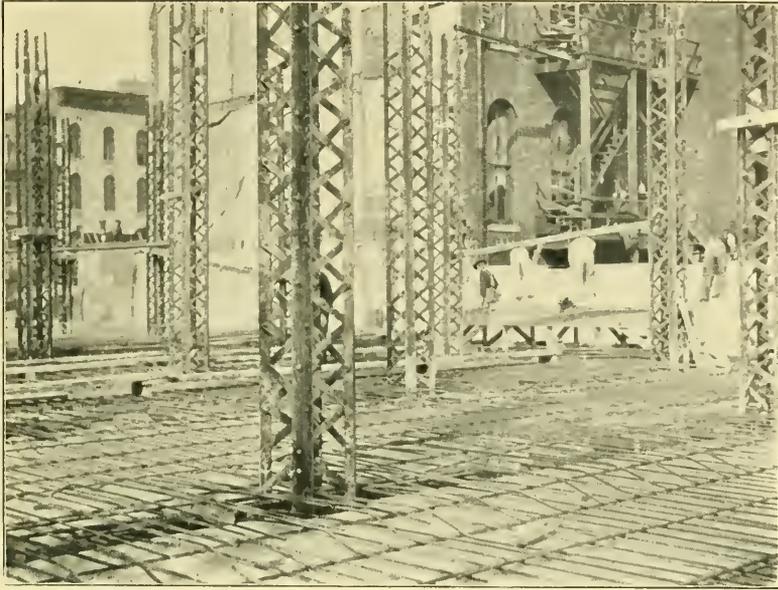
REINFORCING OF COLUMNS AND FLOOR, MANUFACTURERS' FURNITURE EXCHANGE BUILDING.
